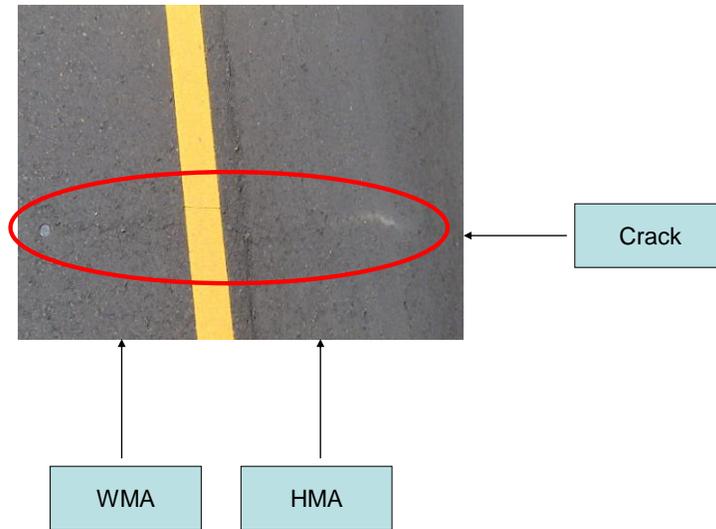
Second Crack Observed in WMA Full Paving Section
